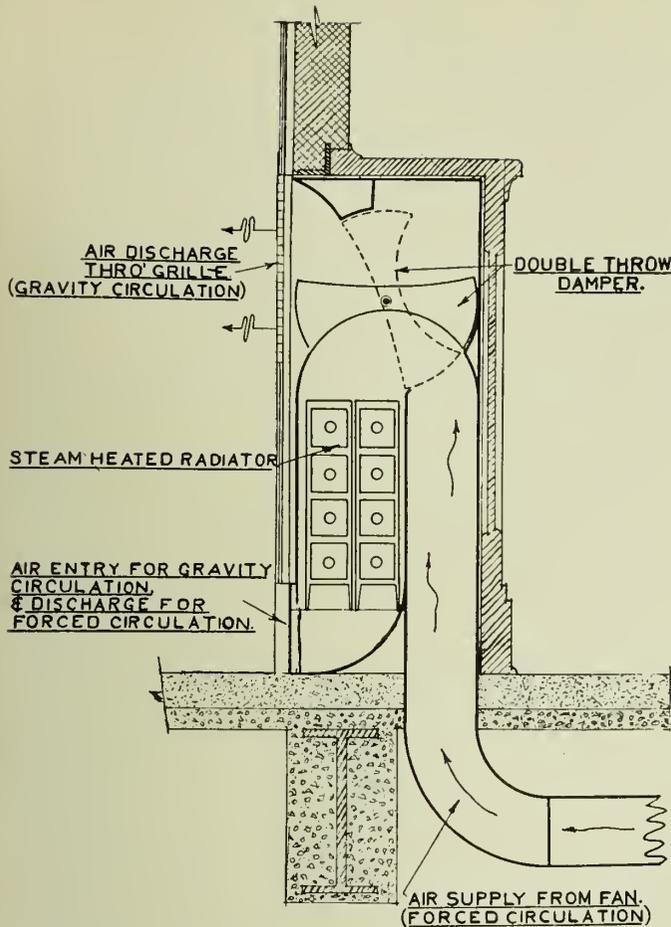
Typical Detail of Heating Units. Main Entrance Halls.
